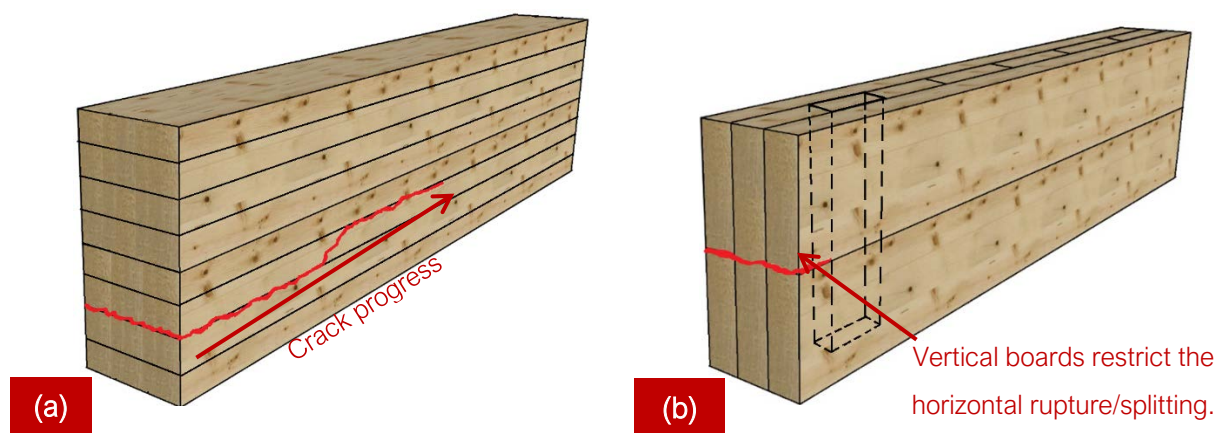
Progressive cracks in beams; a) Traditional GLT beams with continuous progressive rupture; b) CLT beam's perpendicular lamella restrict the rupture from progressing down the span.
